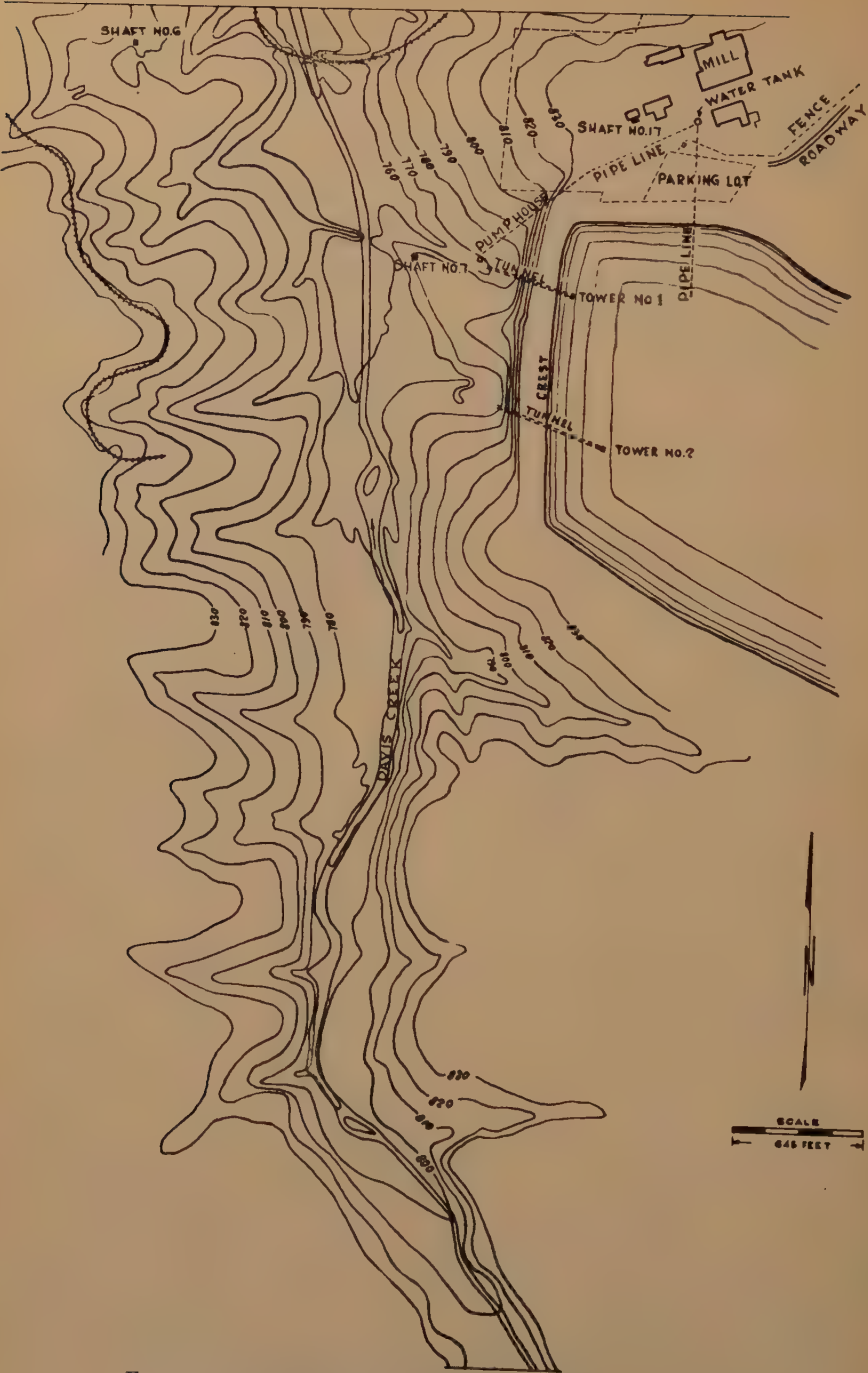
DAVIS CREEK SLIME POND BEFORE BUILDING OF DAM.
